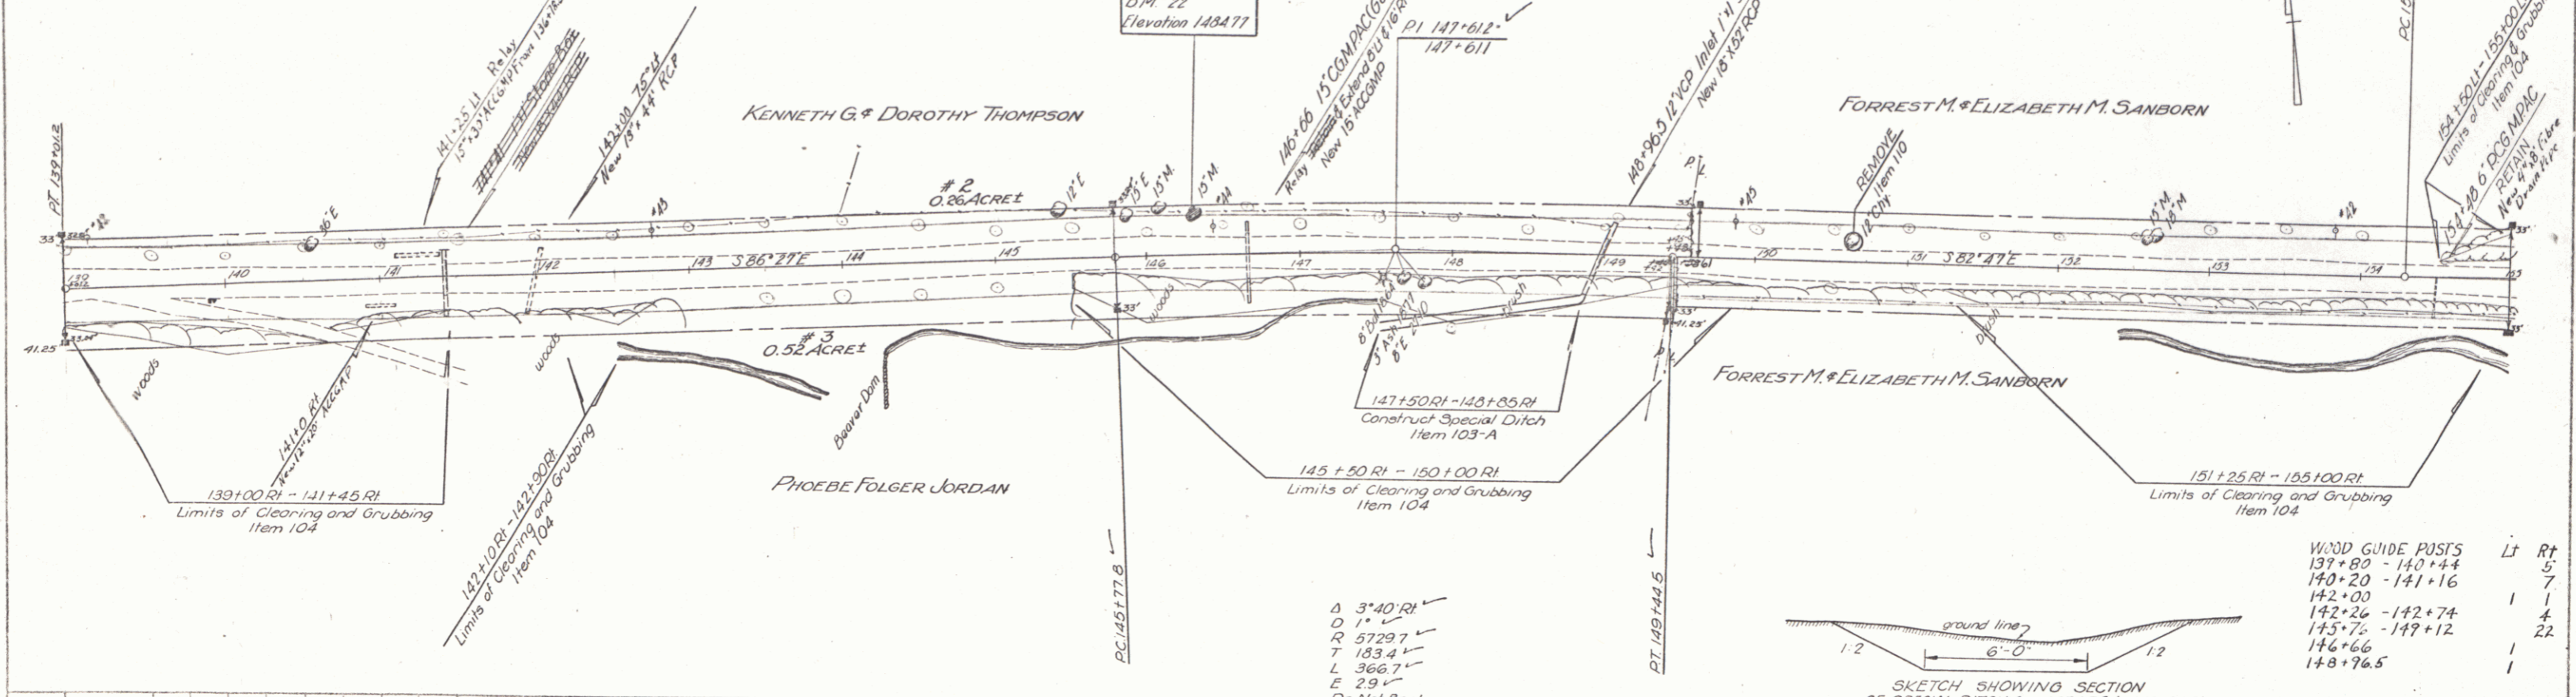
PLAN & PROFILE - P. & S. S. STANBROOK
